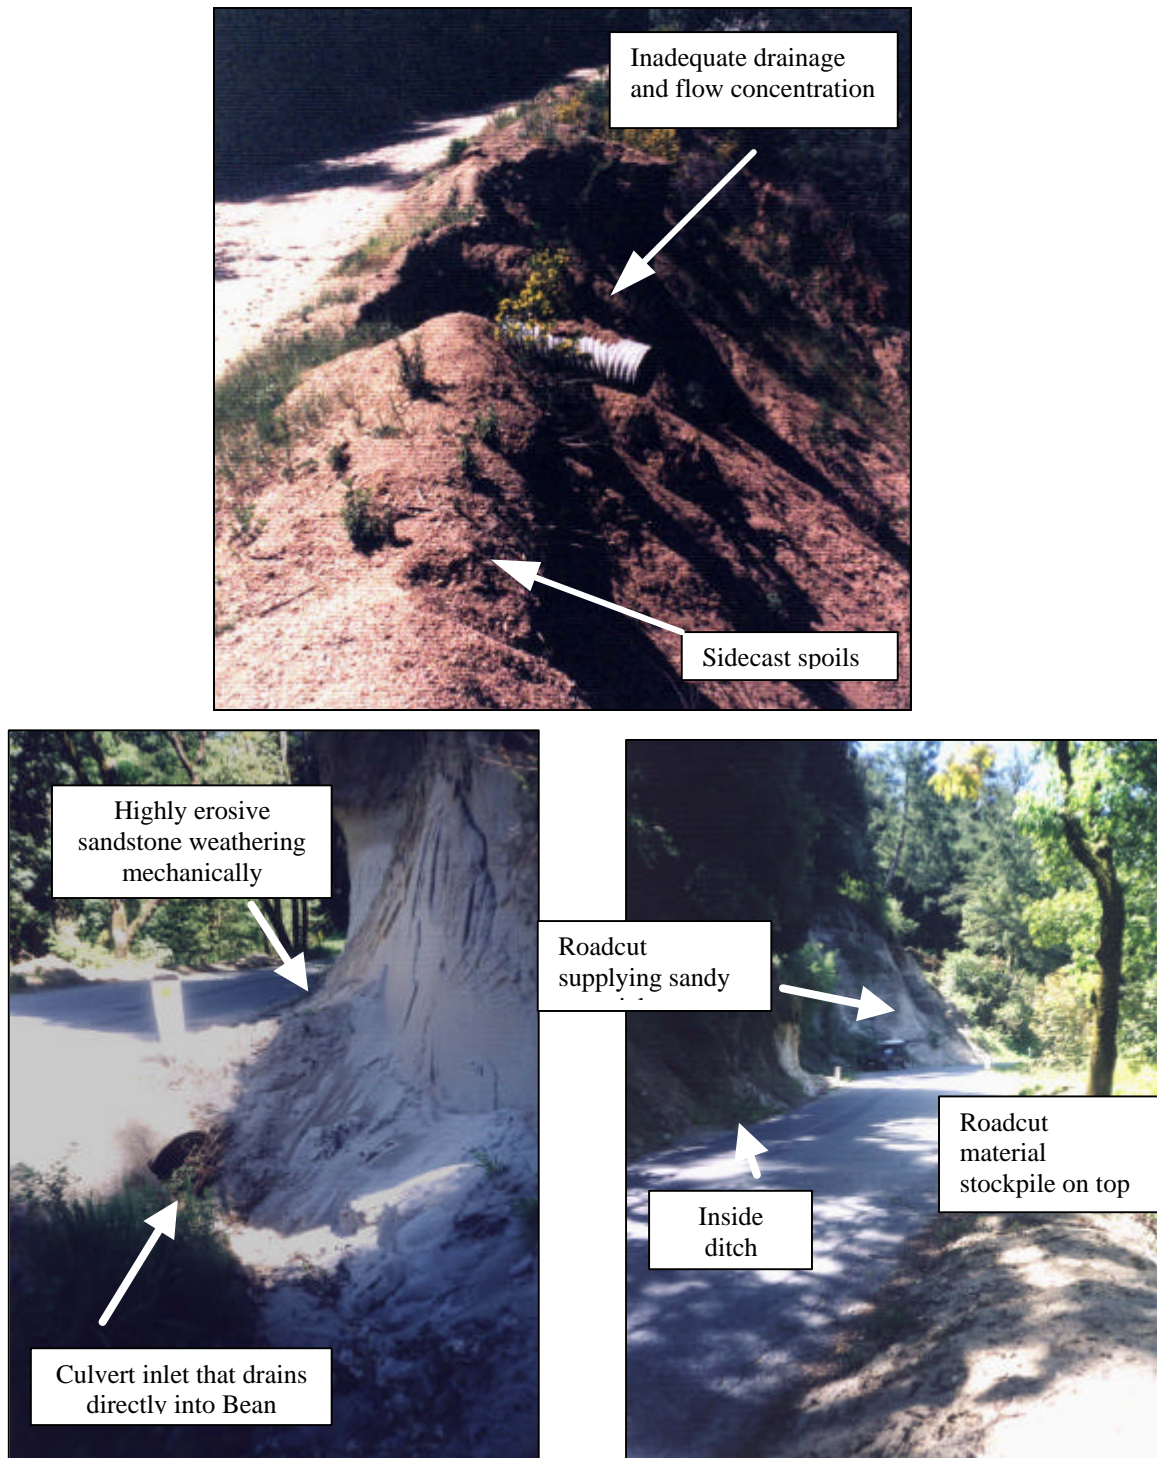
Typical plugged and failed culvert and associated slope erosion on private road in upper watershed (upper photo). Eroded roadcut in the Bean Creek subwatershed (lower left photo). Roadcut and road spoil material (lower right photo).
